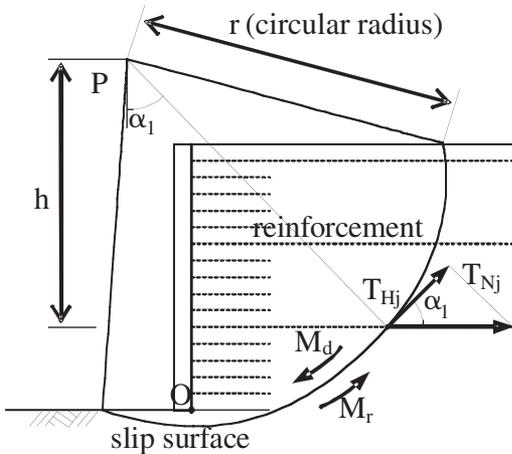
Modeling of GRS retaining wall for external stability analysis.
